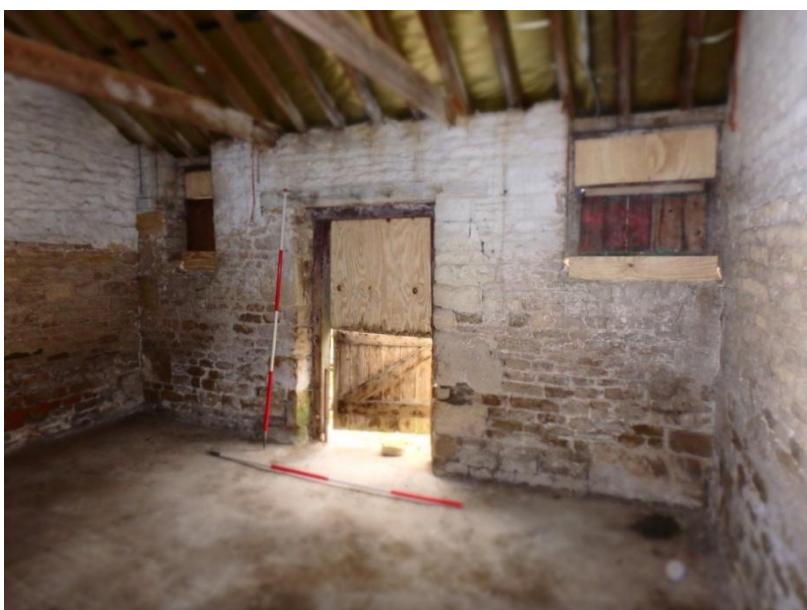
View of the roof supporting structure of Cell 8, from the south
